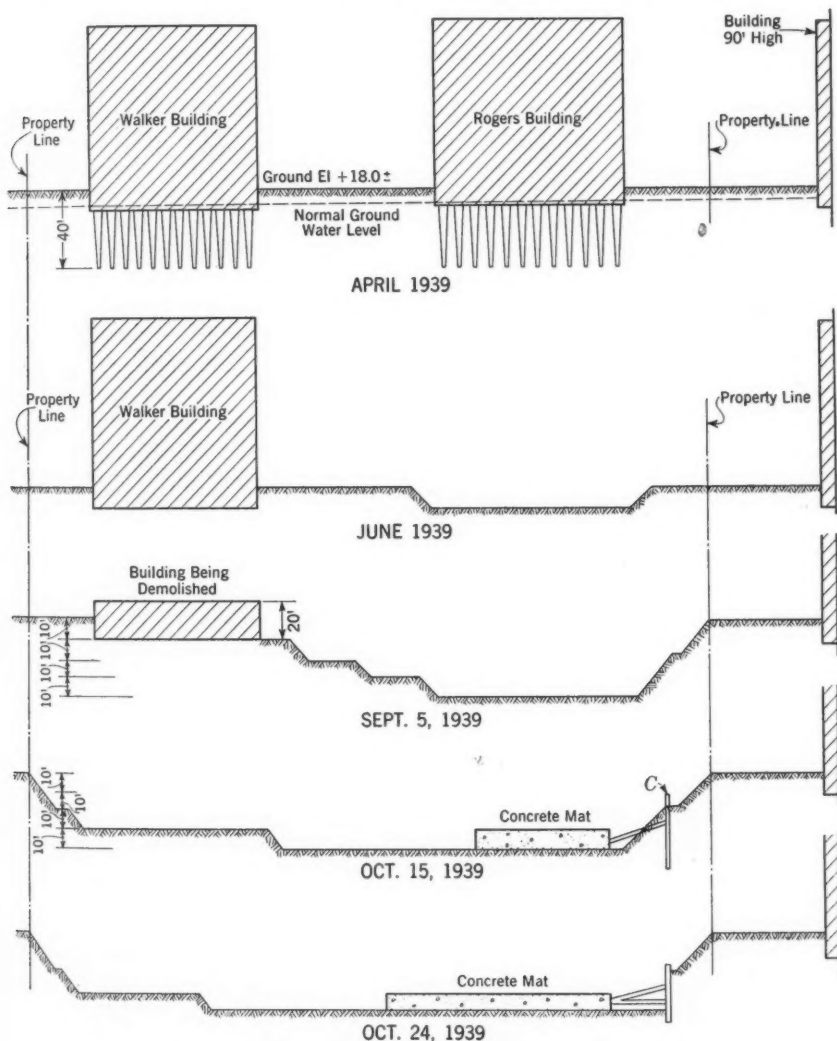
SUCCESSIVE MEASUREMENTS OF SECTION A-A, FIG. 20
